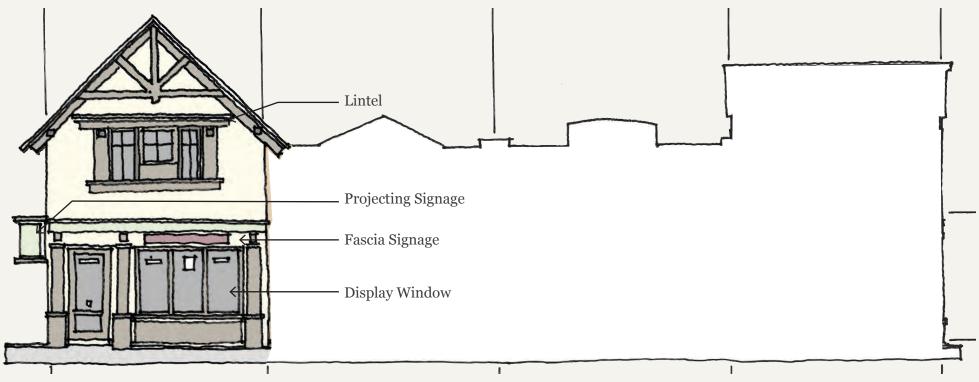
TYPICAL BUILDING ELEVATION - SIGNAGE
